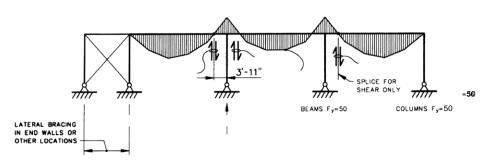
(c) Type SF — cantilever-suspended span system, braced against sidesway
